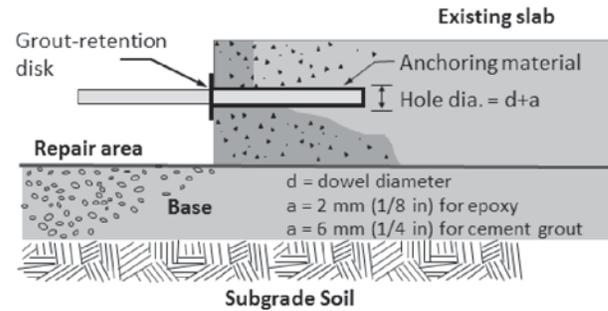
Epoxy-grouted dowel bar anchoring in a drilled hole.
